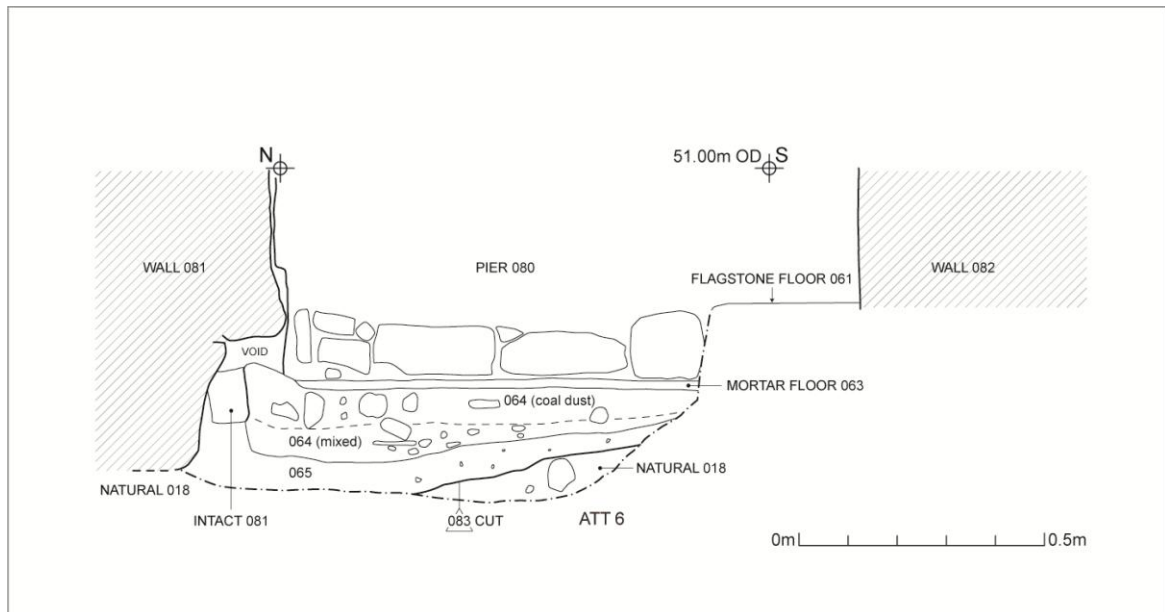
ATT6, west facing section, showing truncation of the wall 081, the possible robber trench 084, floor 063 and pier 080
